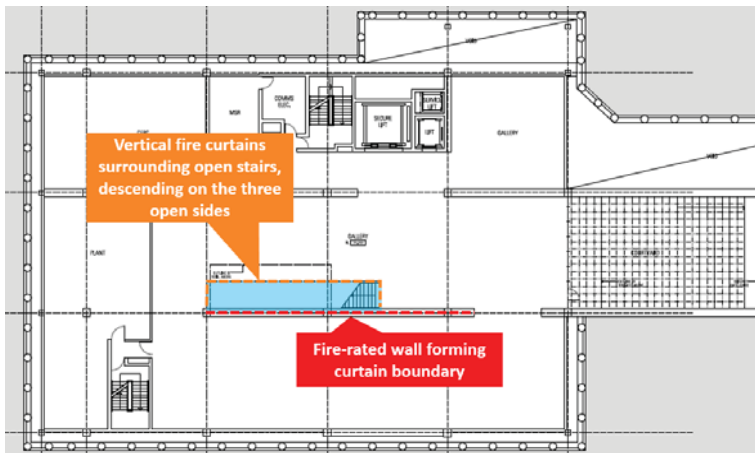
Lower Level 1 plan illustrating vertical fire curtains surrounding the open stair
